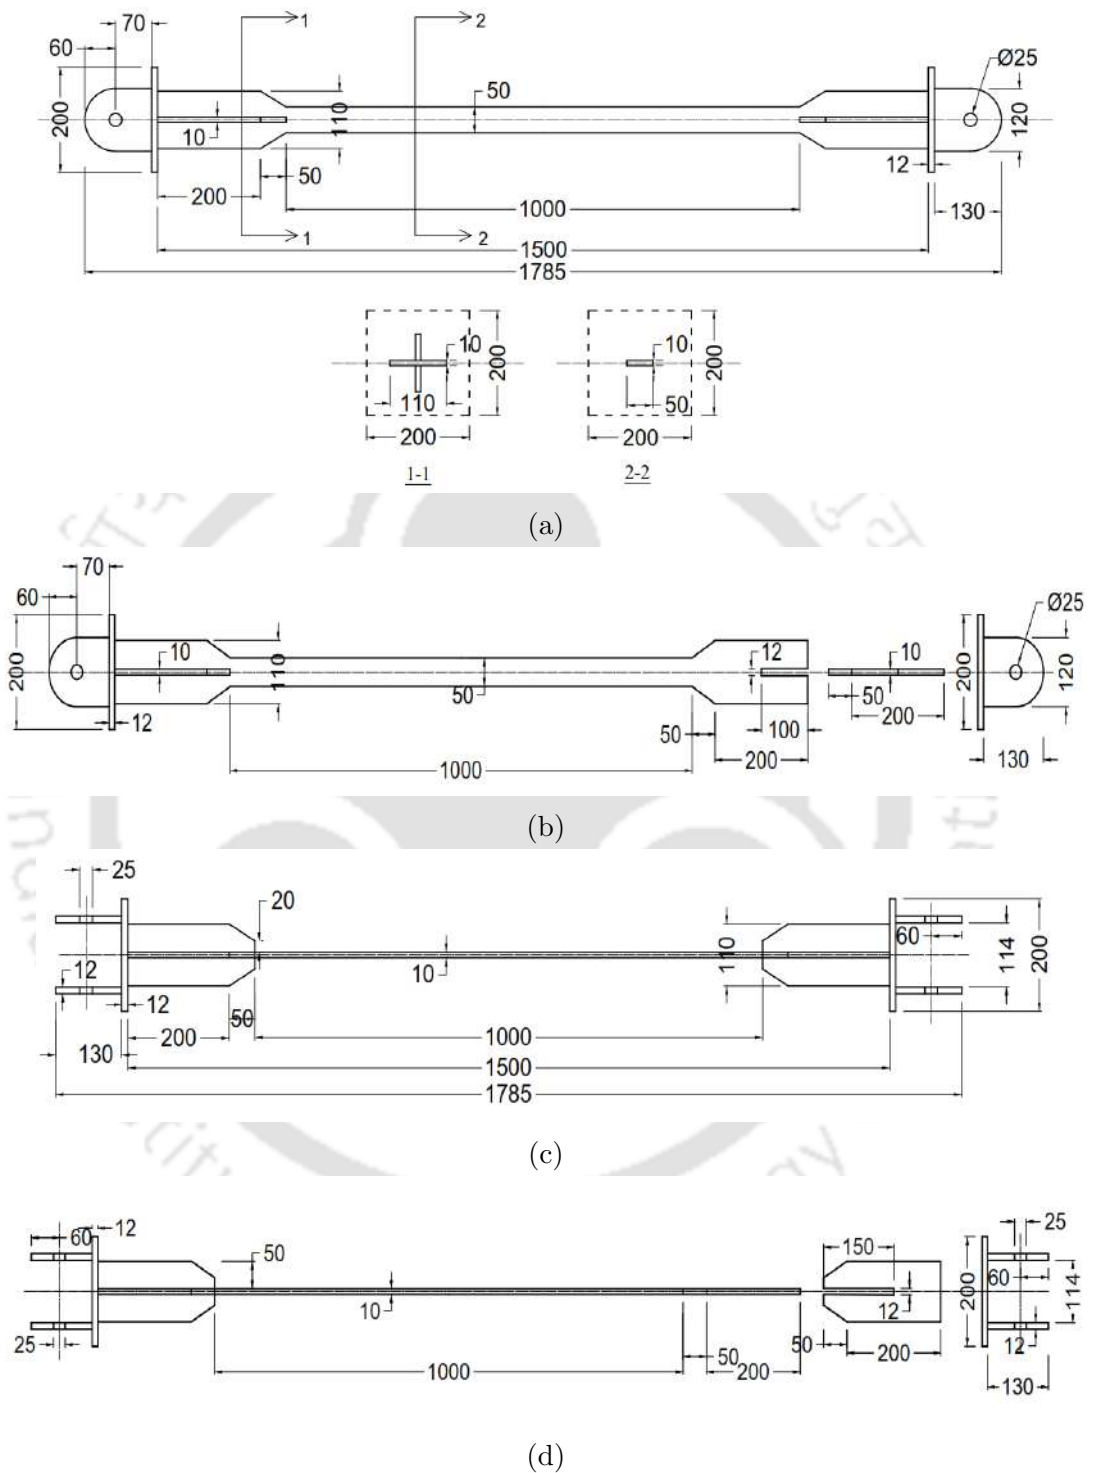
Details of (a) assembled core (top view); (b) disassembled core (top view), (c) assembled core (side view); (d) disassembled core (side view)
